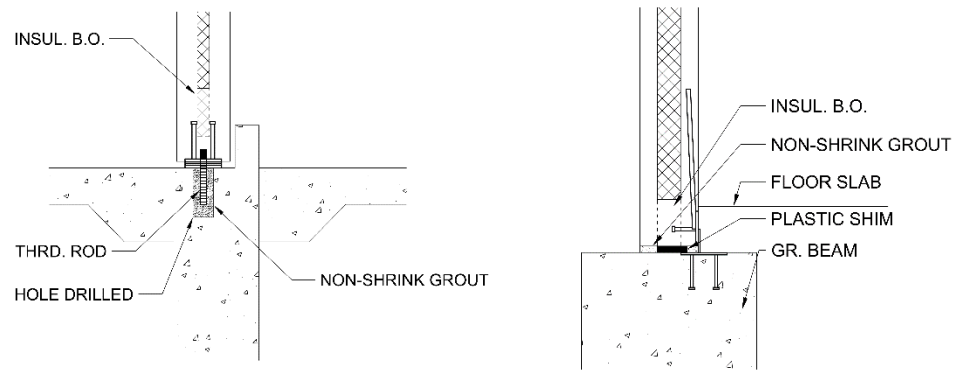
Sample foundation connection details where insulation blocked out at connection and filled with concrete
